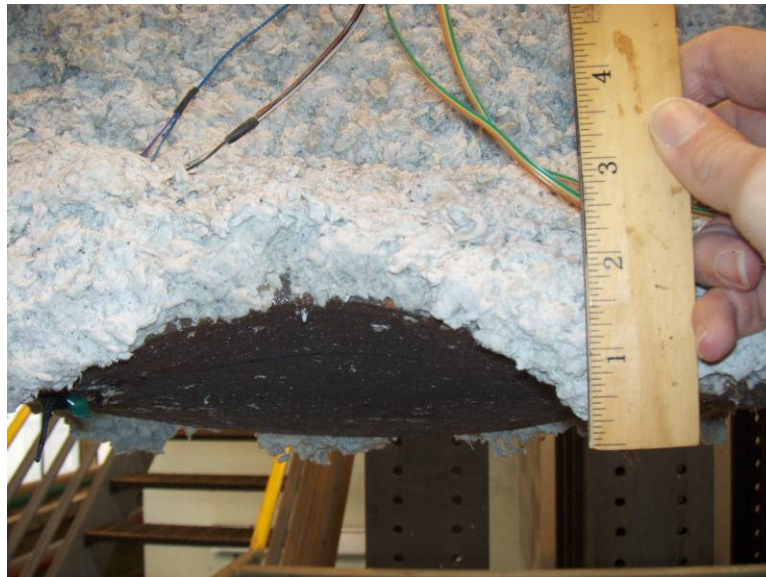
Close-up of buckle in bottom flange of DM at completion of testing
